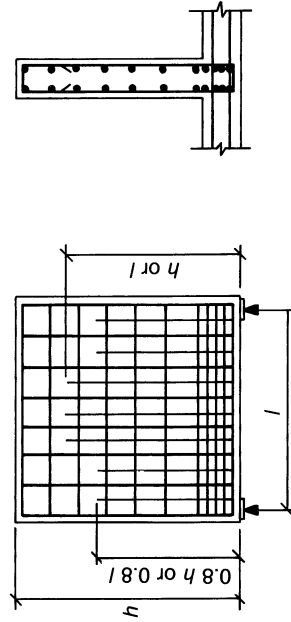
Recommended reinforcement layout for suspended loading (schematic)
